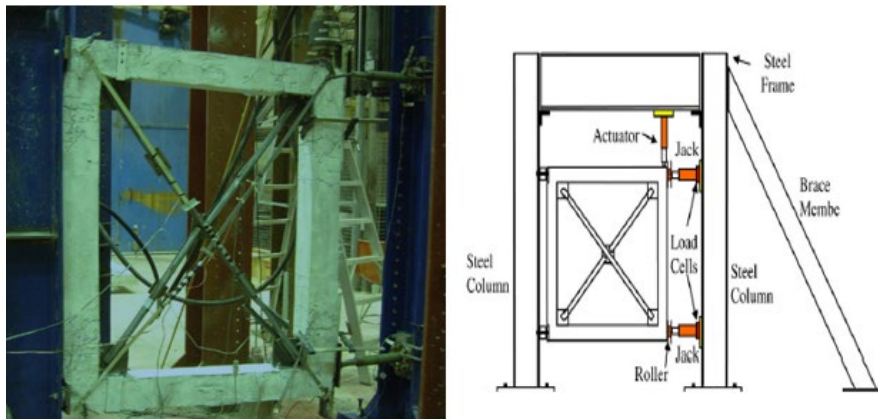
Lateral load resisting frame specimen setup (Youssef et al. 2007)
